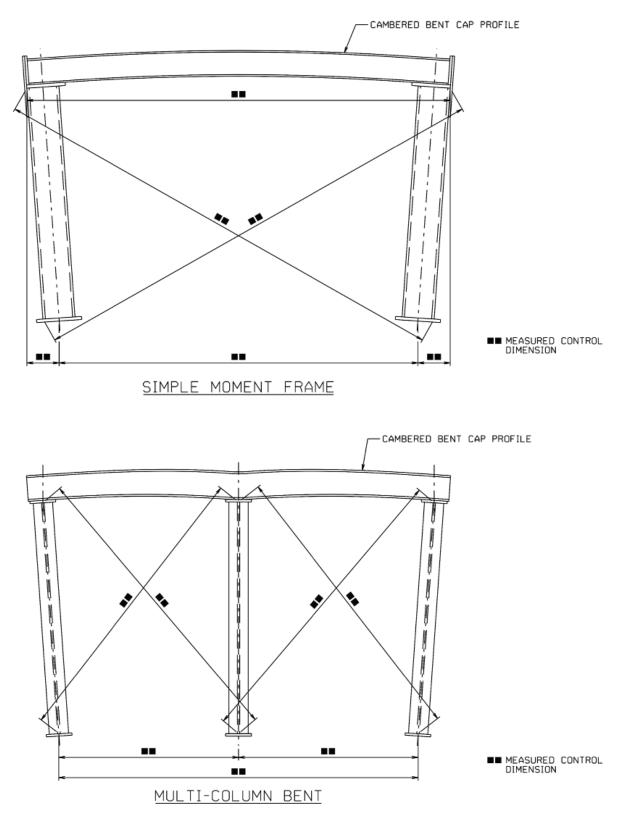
Straddle bent piers with steel columns at no-load profile lay-down assembly
